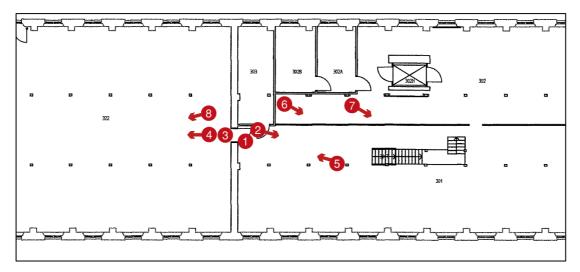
Camera placement and direction. Camera 1 and 3 was placed over the door and was filming downwards.
